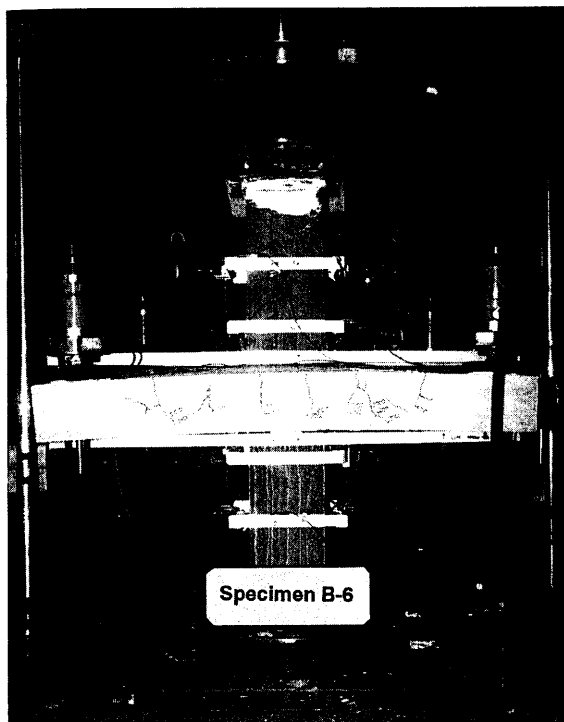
Test of Specimen B-6 (Loaded Slab)
